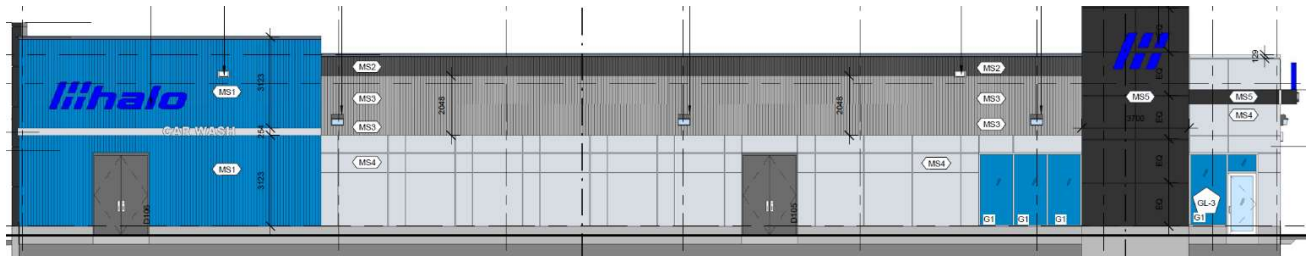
Exhibit L: West Elevation of the Building showing the entrance to the car wash tunnel and the vertical and horizontal projections on the west façade and north façade as well as the corporate branding
